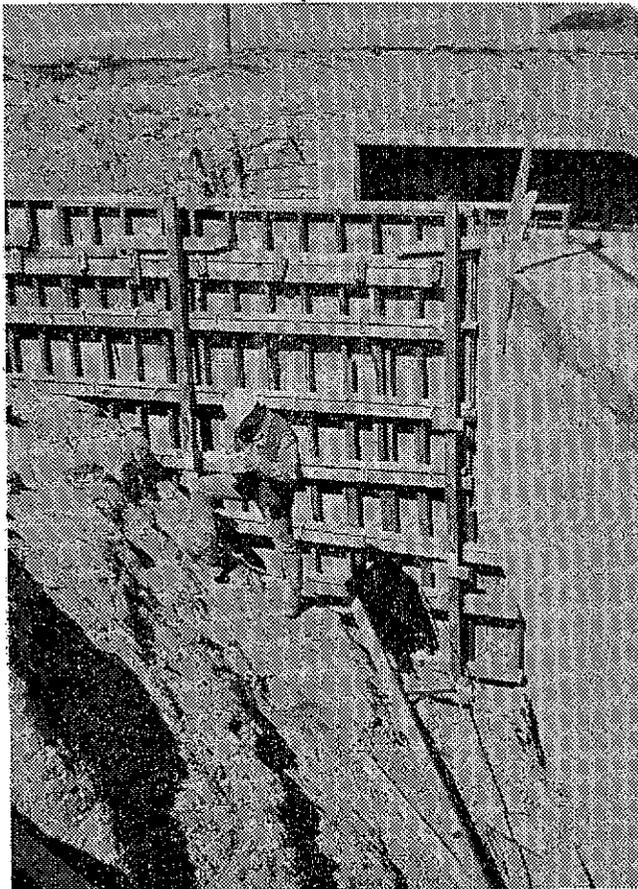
Abutment prior to backfilling at the Via Princessa Undercrossing.
